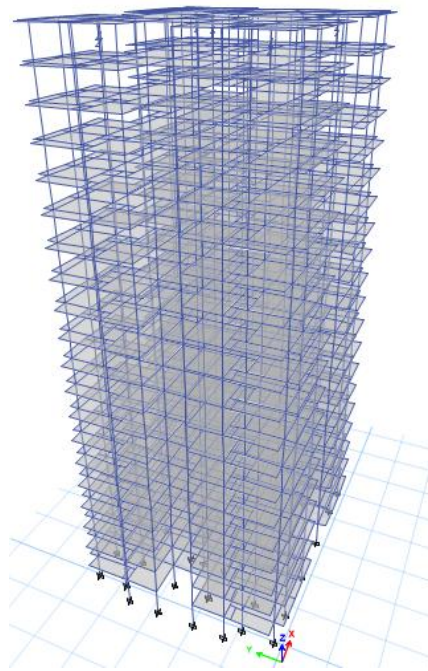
Shows the skeleton model and 3d view of the structure with TMD at top floor
